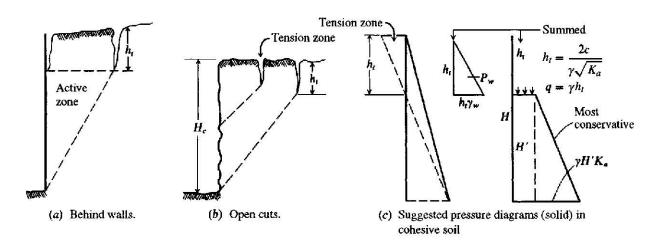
Tension crack and critical depth of an unbraced excavation. Tension cracks are often readily visible adjacent to excavations.
